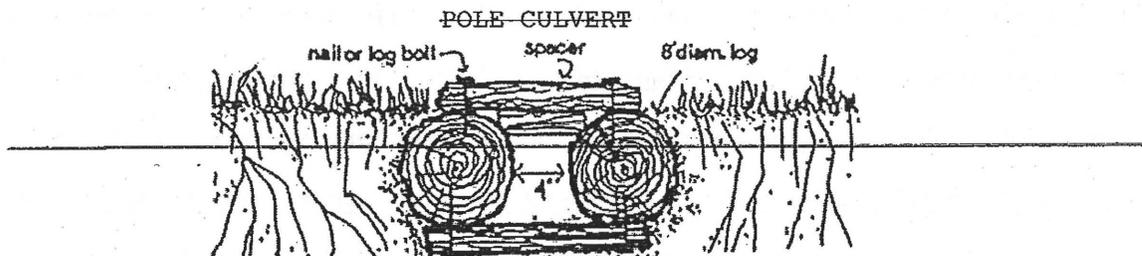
Proper Construction of Pole Culverts on Logging Roads.
